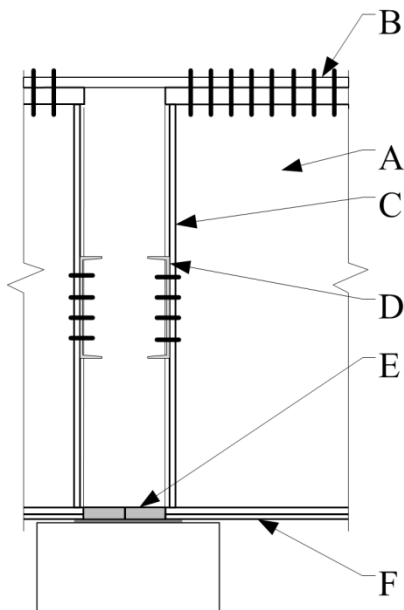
U.S. 70 over Sonoma Ranch Road SMC detail
